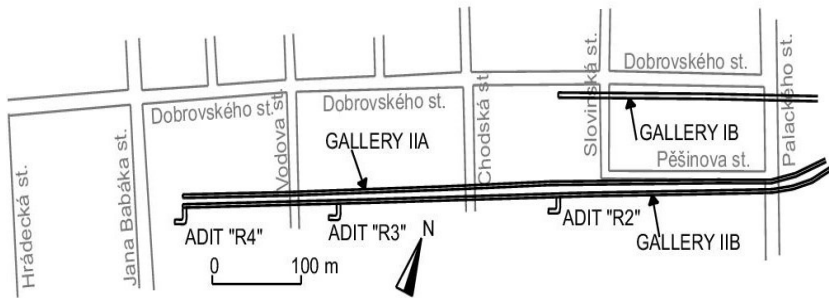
Underground works during Královo Pole Tunnels site investigations – Exploratory galleries and unsupported adits (Pavlik et al. 2004).
